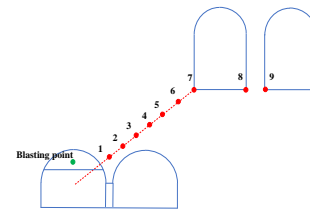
Connection of underlying tunnel and tunnel-type anchorage and monitoring points layout of anchorage
